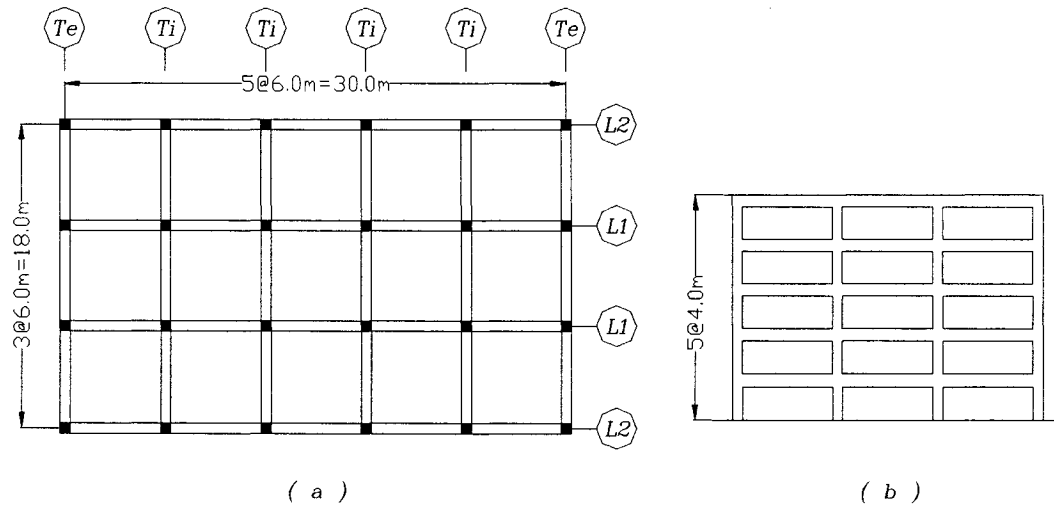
Building #3; (a) Plan of floors, (b) Elevation of transverse frames
